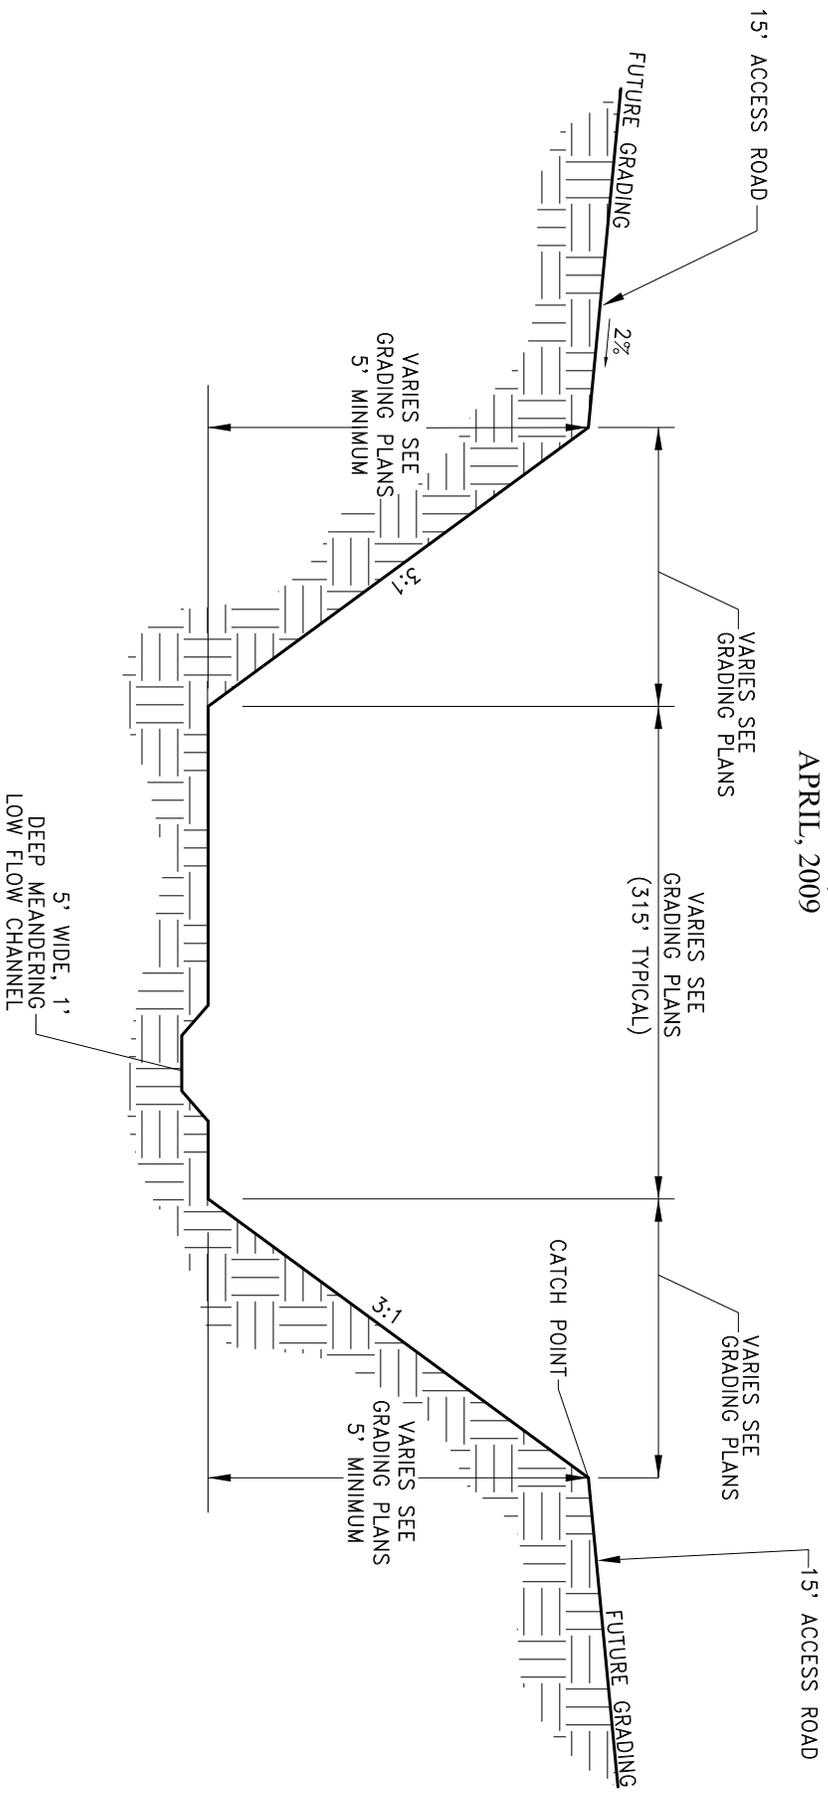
CROSS SECTION B-B RED STONE
